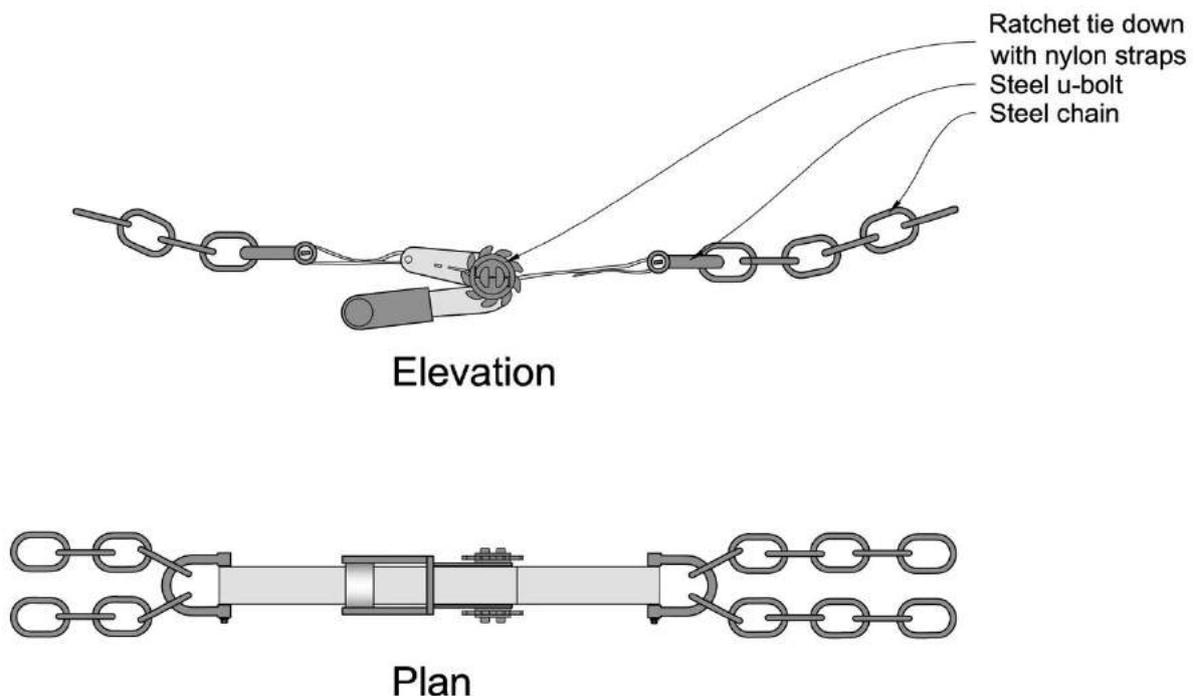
Elevation and plan of a simple ratchet device and attachments used to lightly tension straps during installation.
